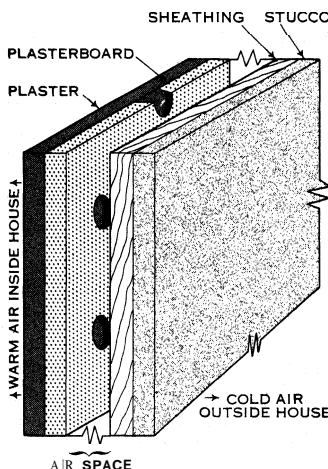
SECTION OF A SIMPLE HOUSE WALL
